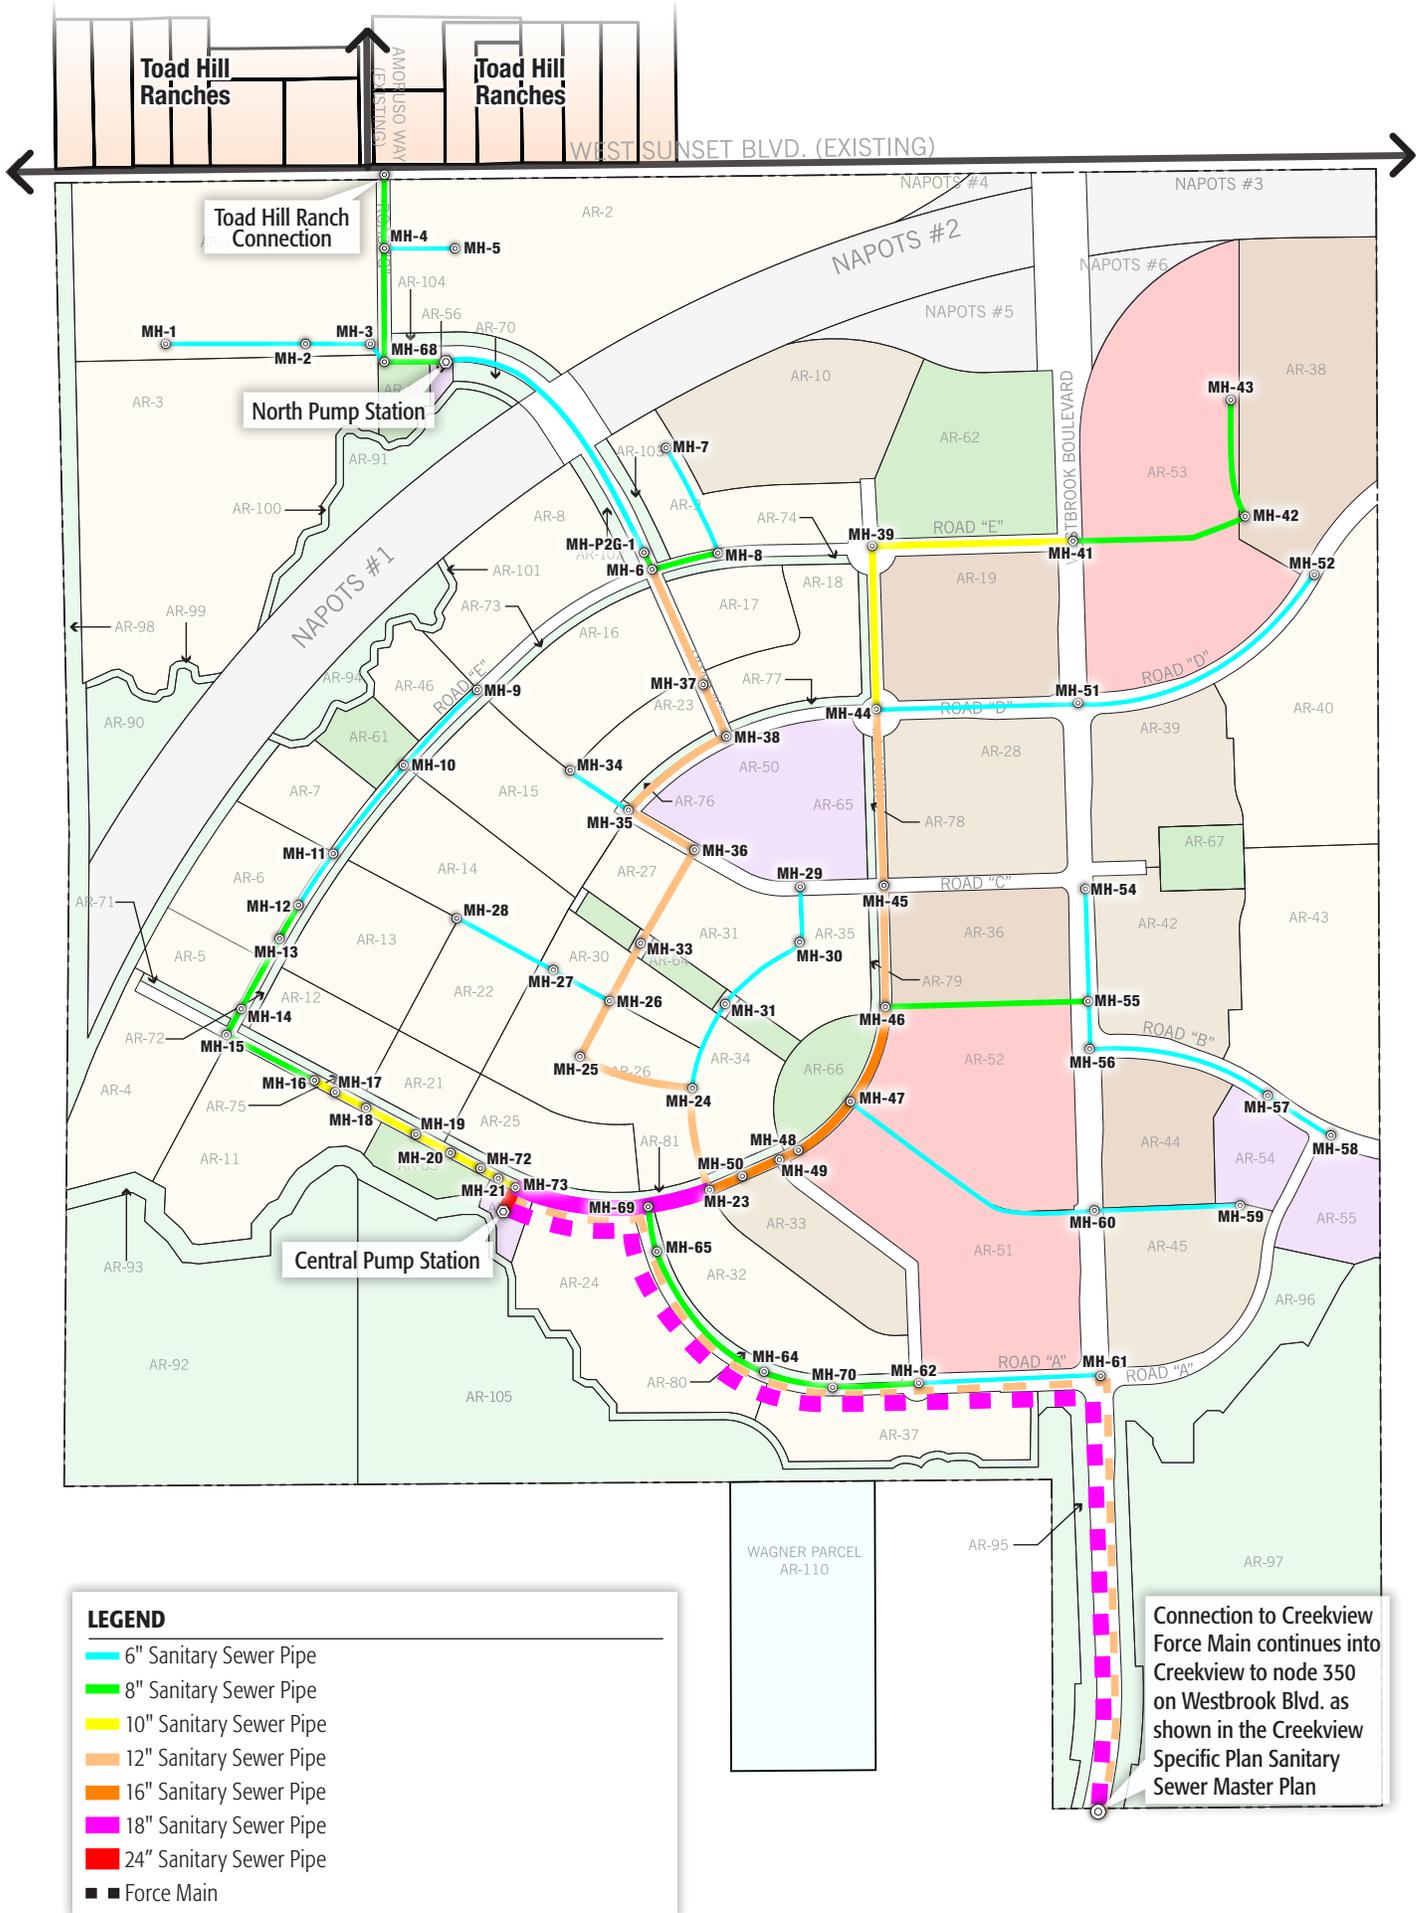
Amoruso Ranch (Wastewater System Manhole Layout)
